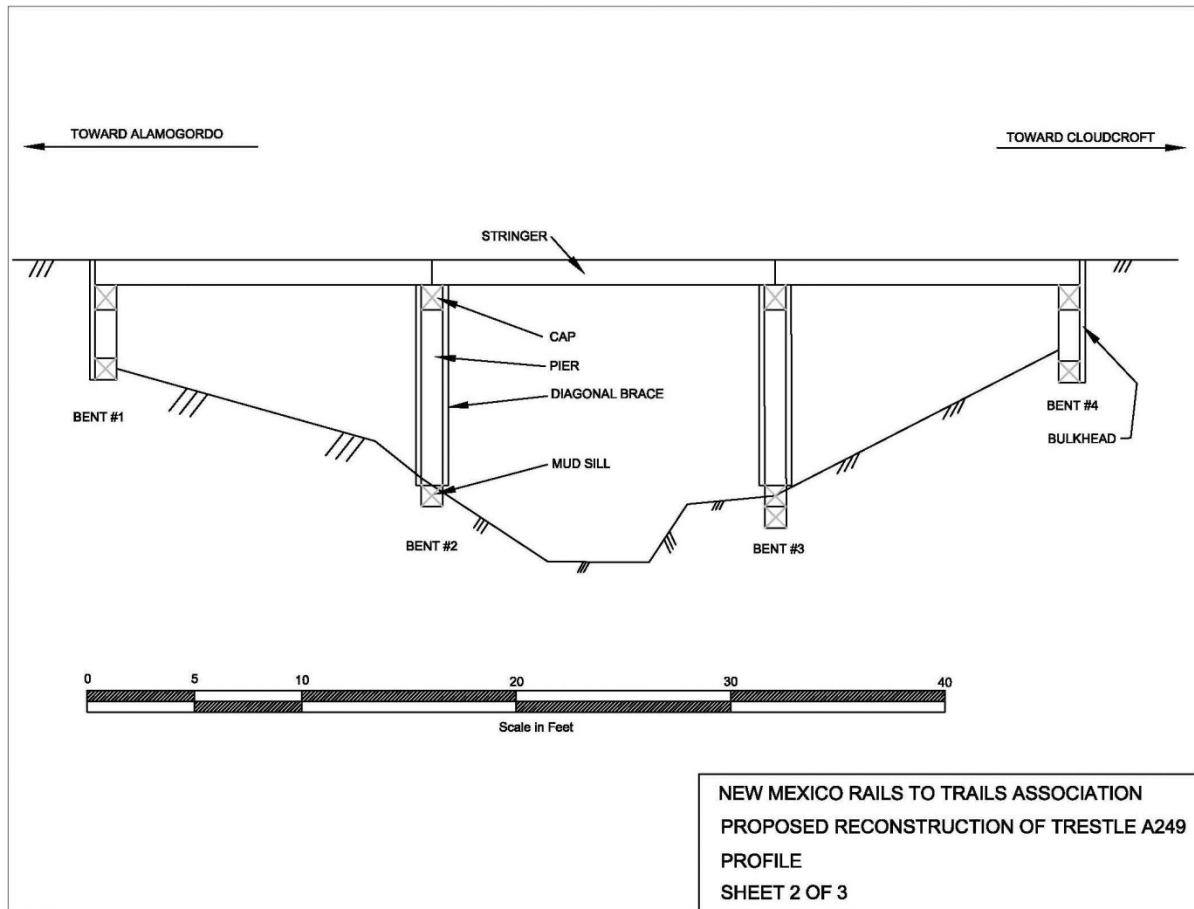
Proposed Reconstruction of Trestle A 249, Profile.
